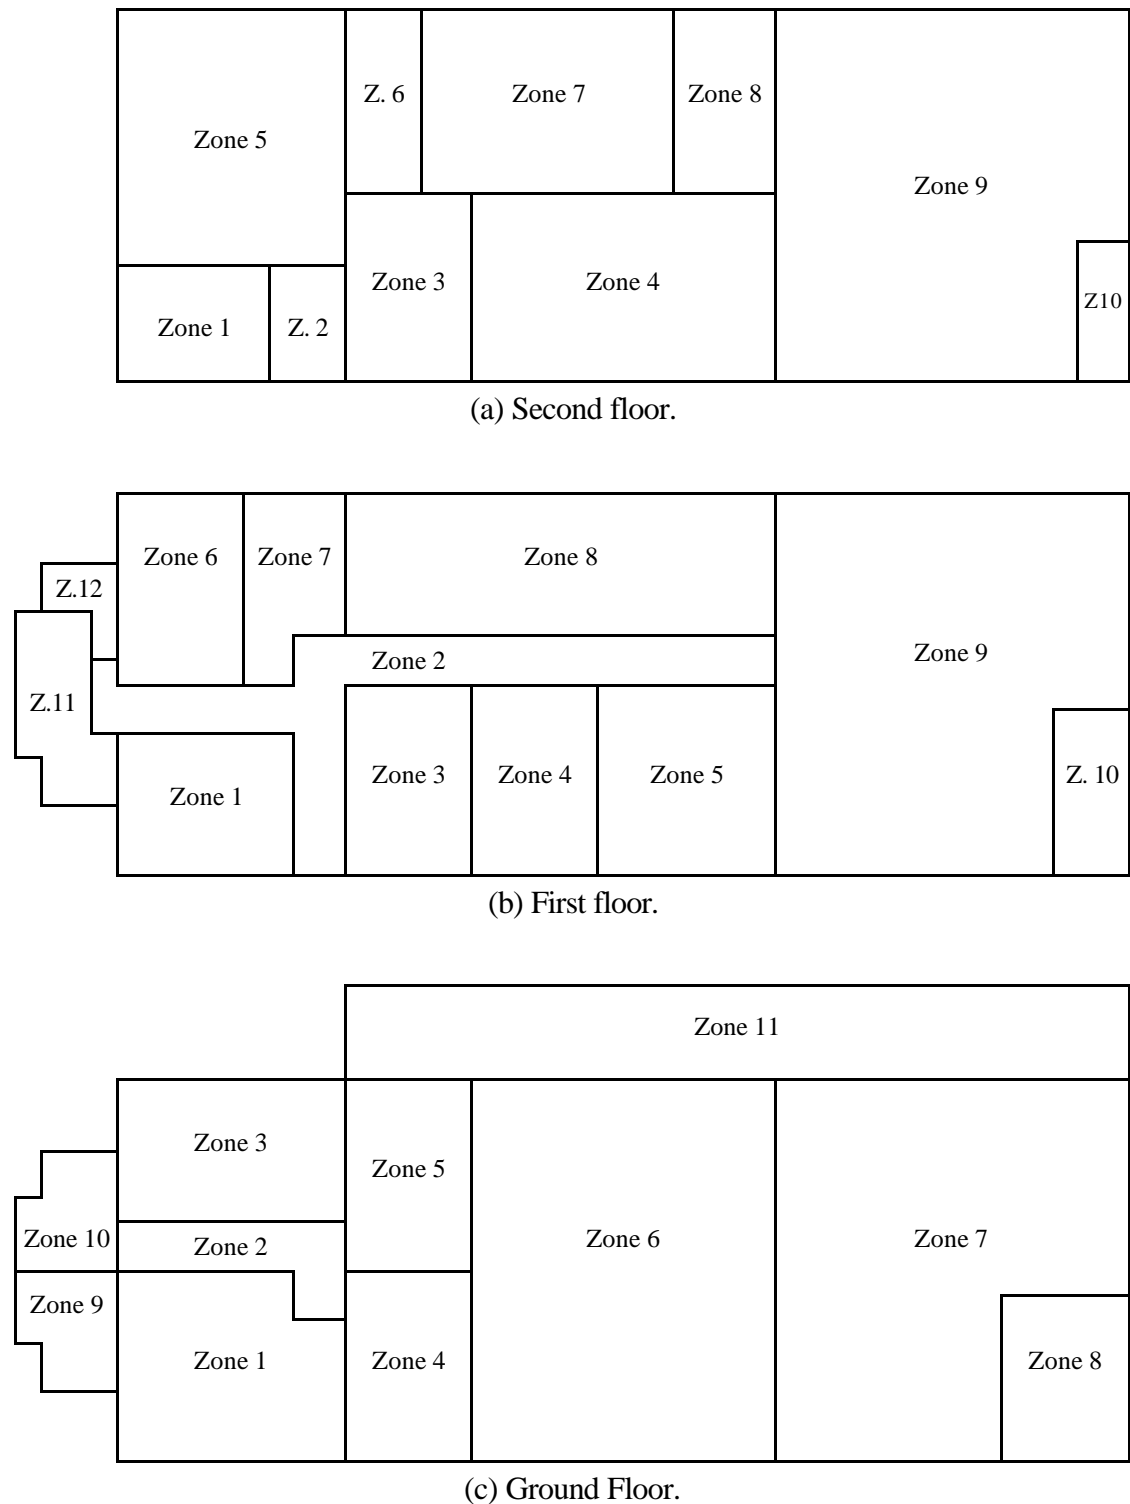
Floor plan of the Estates Services Building as used in the simulations.
